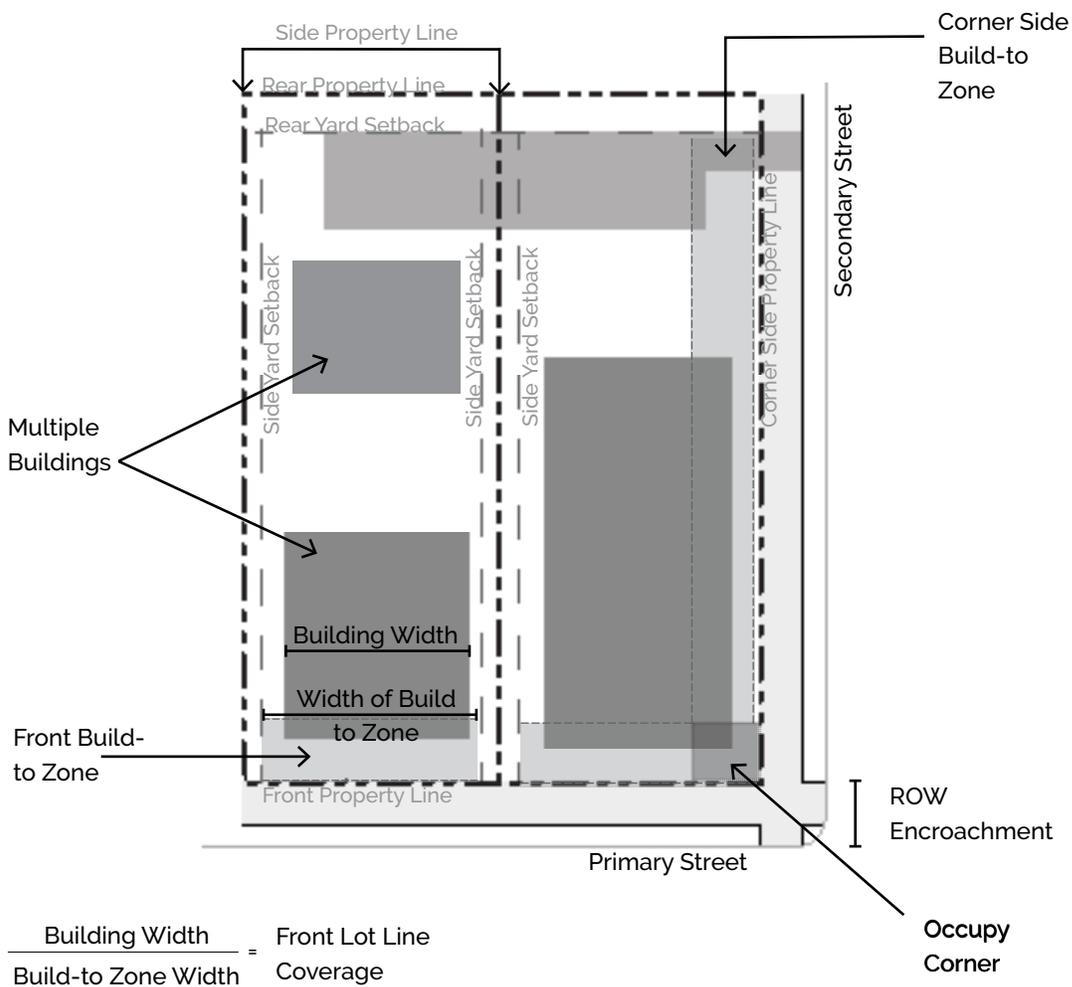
Building Siting: Street Frontage, Lot Area & Front Lot Line Coverage.
